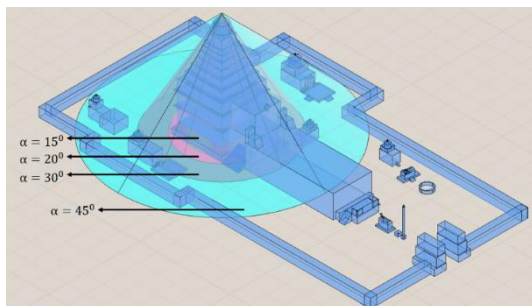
3D Elevation View Layout of Srivimana in Gangaikonda Cholapuram Temple
